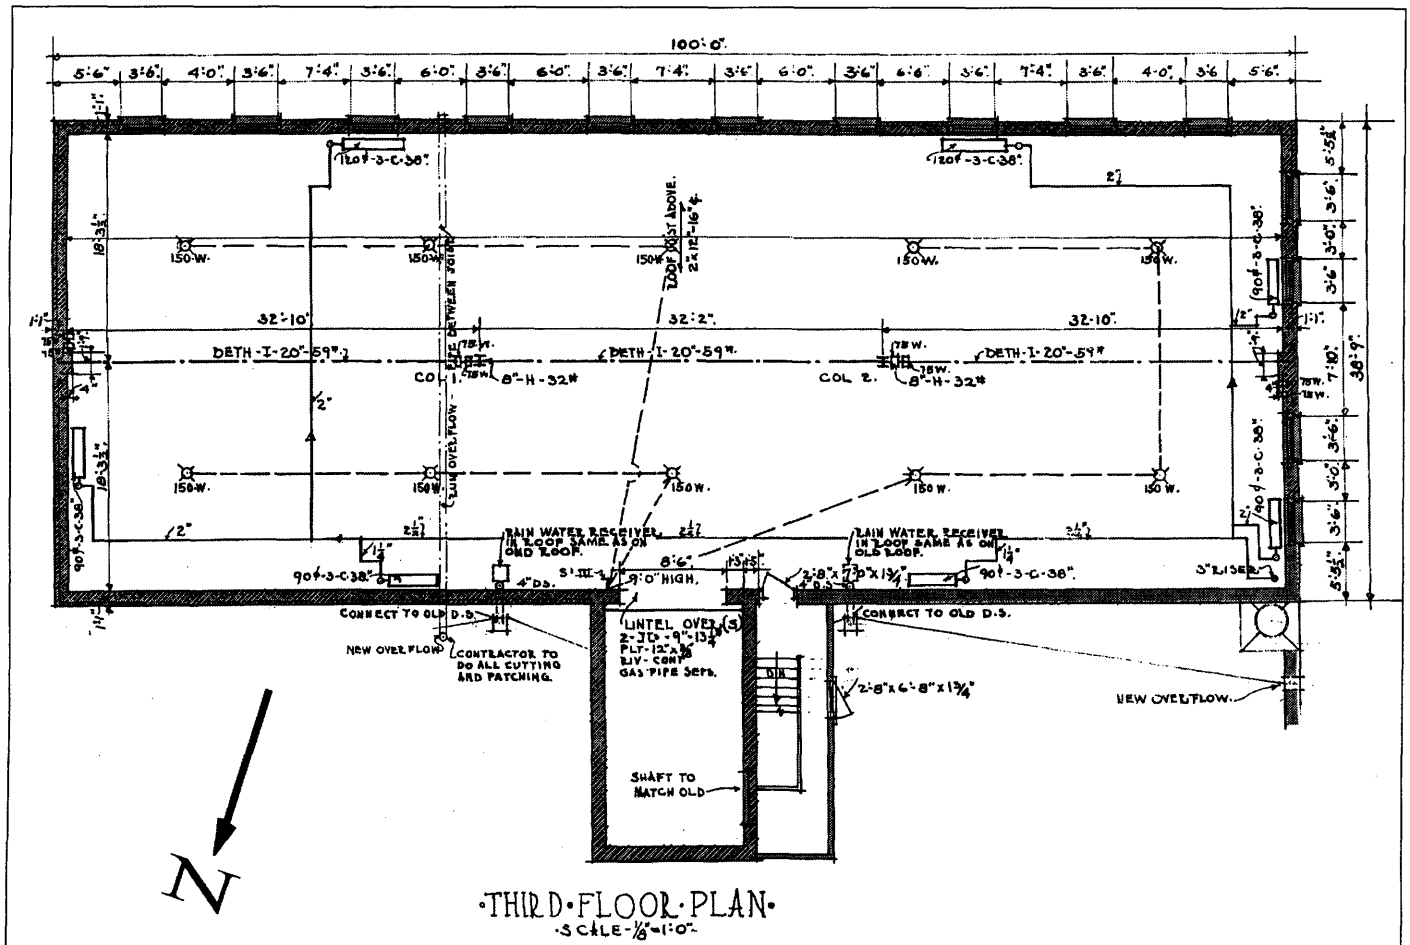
Historic addition third floor plan (Proudfoot, Bird & Rawson, architects, 1919)
